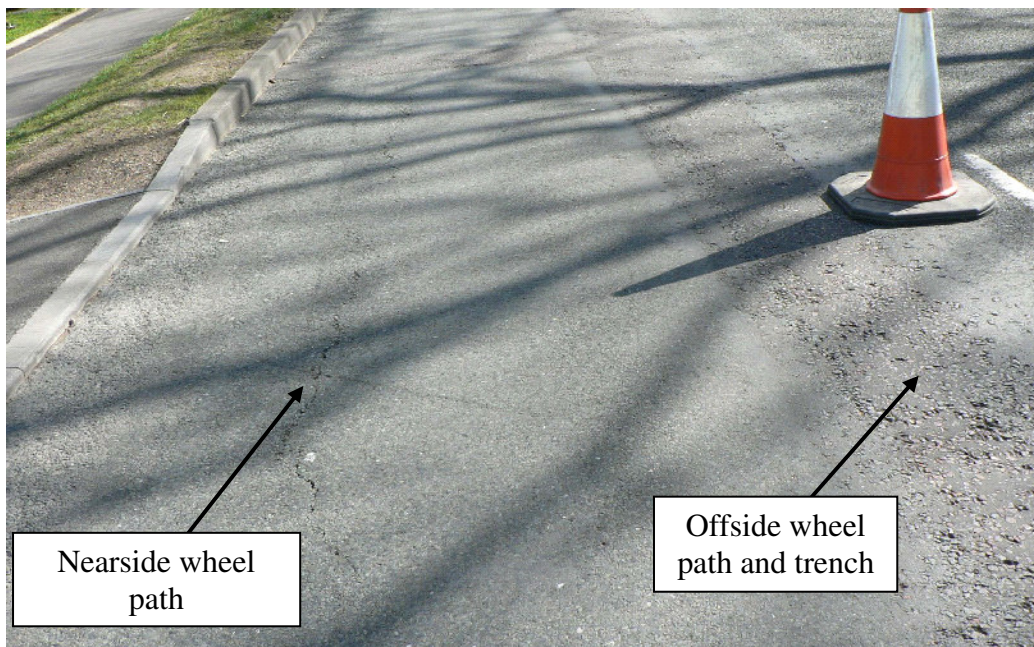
Close up view of rutting and minor cracking in nearside wheel path
